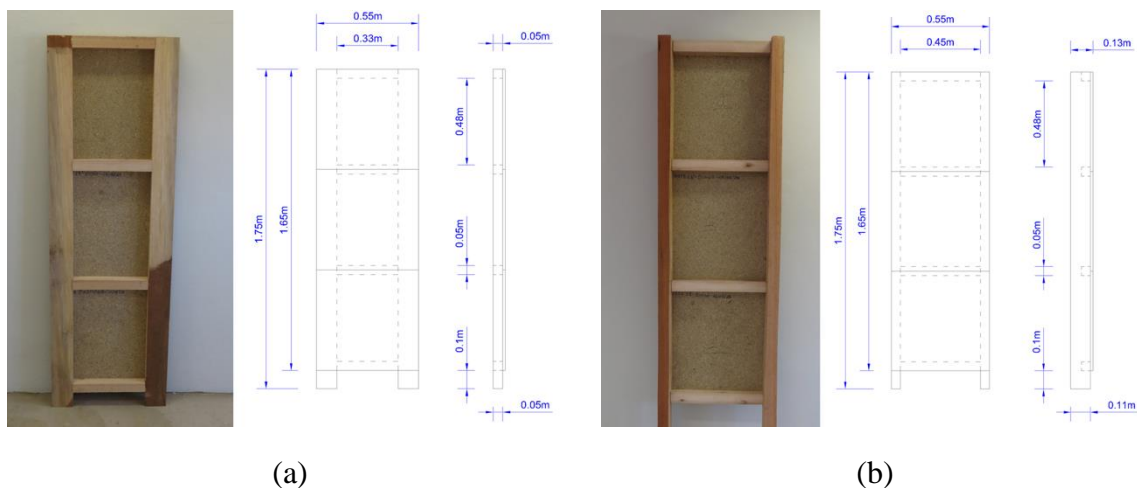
Type of modular panels and their dimensions: (a) Closing Panel. (b) Structural Panel.
